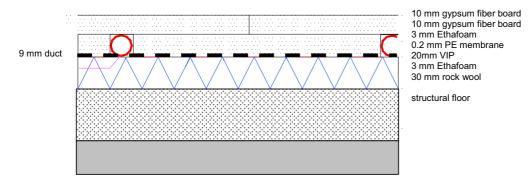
Principle construction layout of an acoustically improved dry VIP based floor heating system (concept 2)
